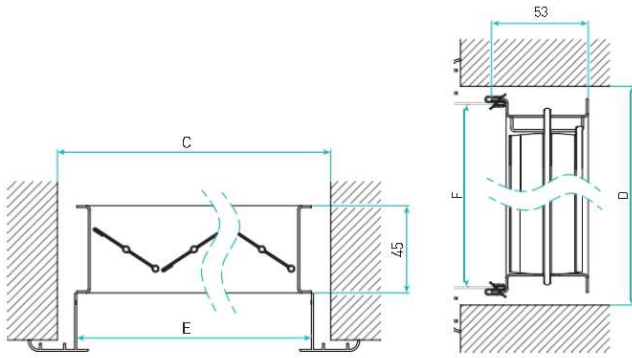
Dimensions of the damper, grille light (E x F) and mounting hole (C x D).
